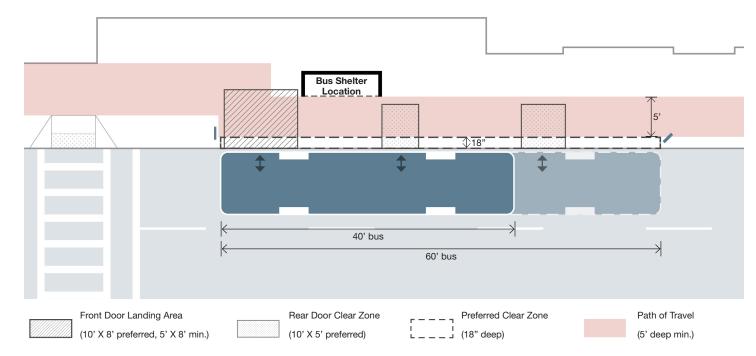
Preferred Shelter Locations for a 10-foot Sidewalk
